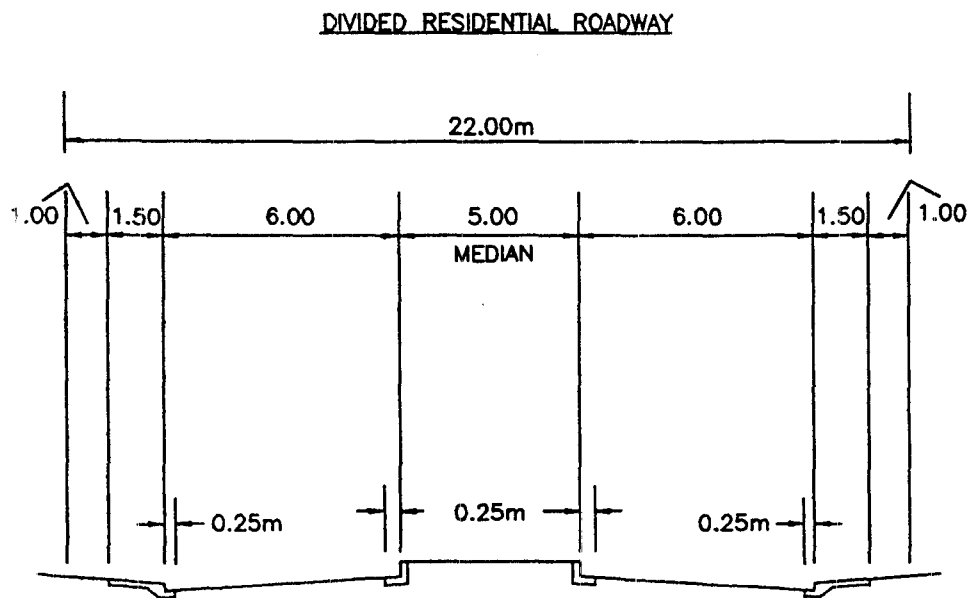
and 5a illustrate the cross sections proposed for the divided and undivided residential roads. Figure 5 illustrates the typical collector road cross sections for a 28.0 m wide divided right-of-way (applicable at site access from Ross Street only) and the 20.0m typical undivided collector. These cross sections conform to the City of Red Deer Design Guidelines drawing B5 and B6. The intent is that the 2.5 metre wide separate sidewalk, or paved walkway, would be located on the same side of the collector road as the 6.0 metre wide municipal reserve strip. This would apply to the collector road from Ross Street to Dempsey Street, and, along Dempsey Street, from 39<sup>th</sup> Street. Figure 5a illustrates the typical divided 22.0m wide local road and standard 15.0m undivided local road within the interior sections of the development.
